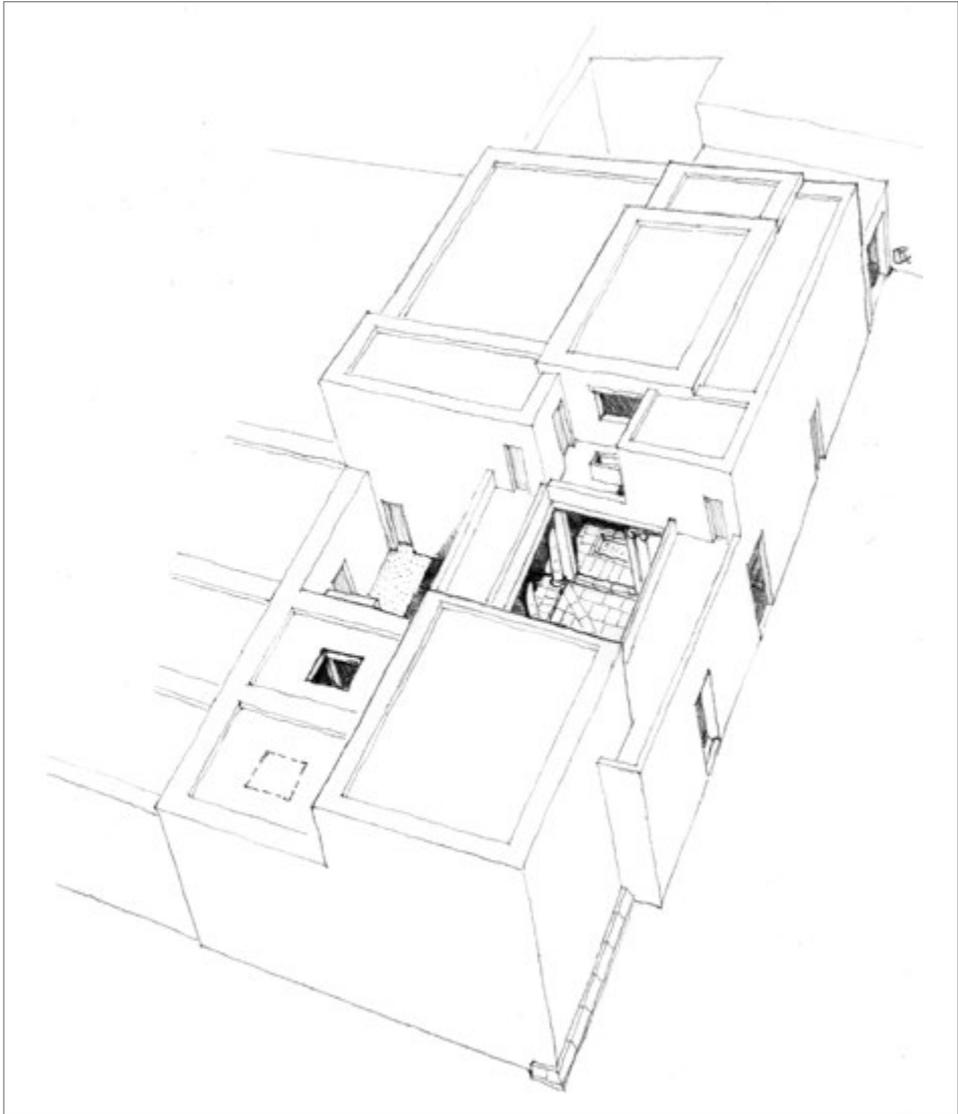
Reconstruction of the form of the roofs and upper floor of House H10 (Reconstruction drawing R. Czerner)
